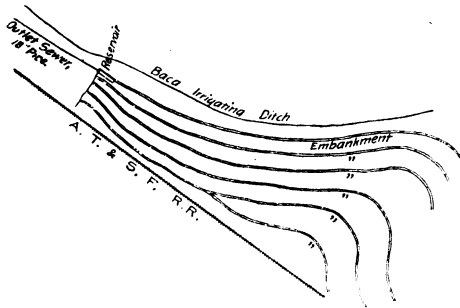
Sketch Plan of Sewage Farm, Trinidad, Colo.; Norval W. Wall, City Engineer.
